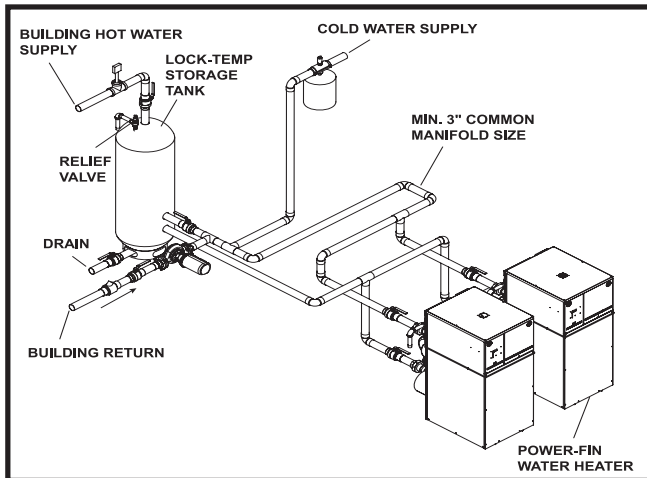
Multiple Water Heater Piping with a Single Storage Tank
